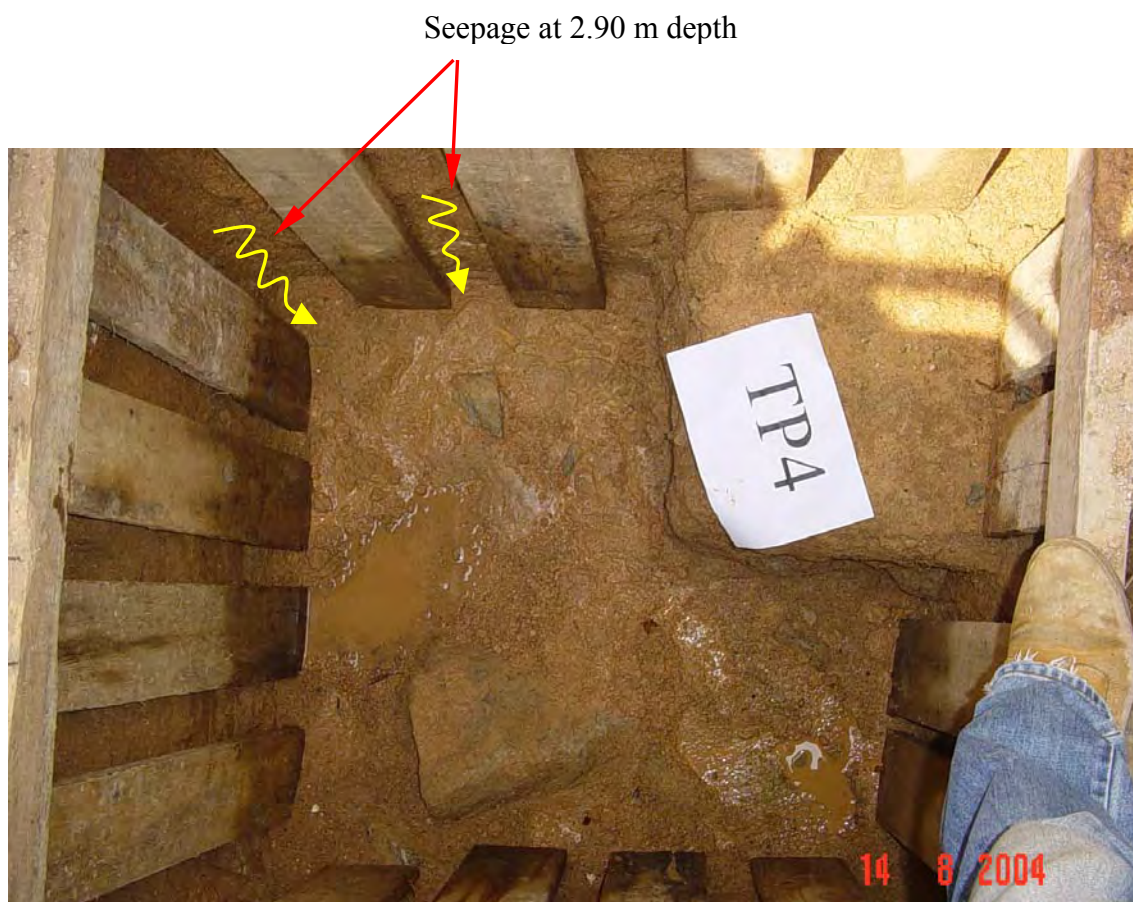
Seepage Observed in Trial Pit TP4 during Excavation
